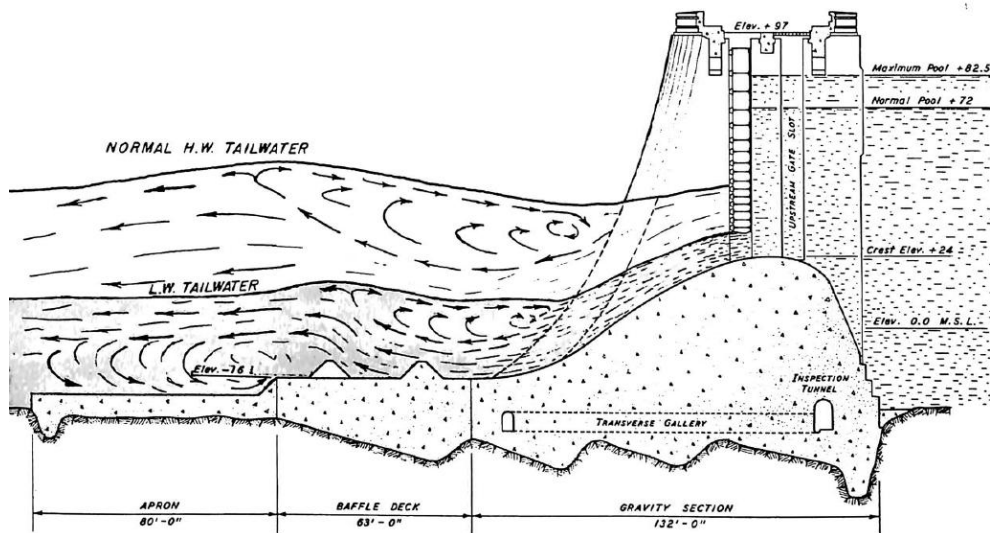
Section of Bonneville Dam Original Spillway (Source: Cochrane, 1959)
